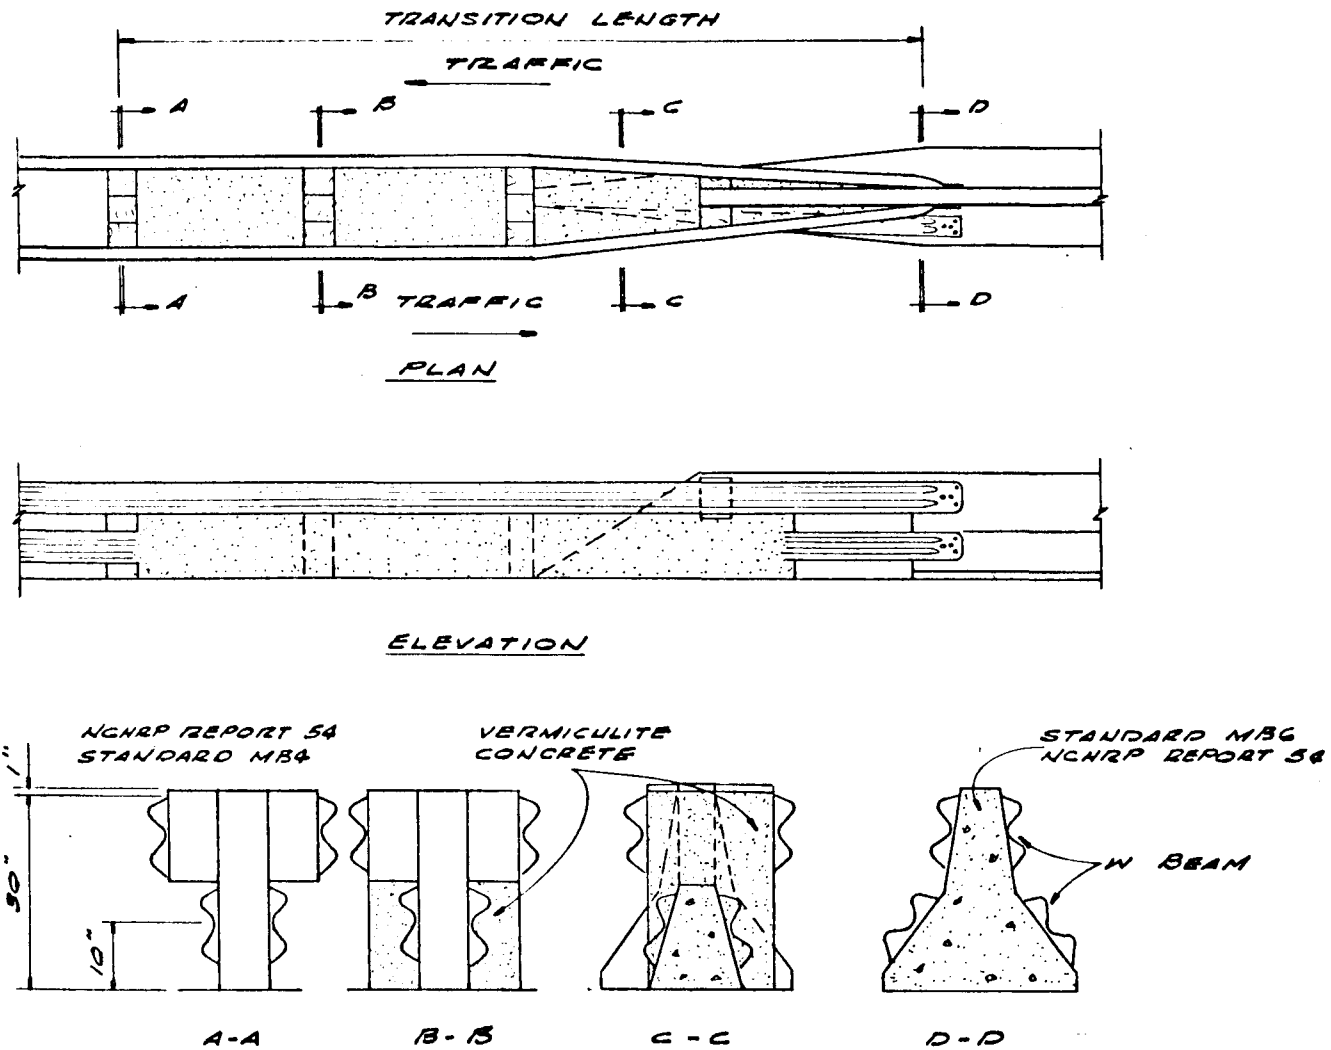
W-BEAM TO CONCRETE BARRIER TRANSITION
